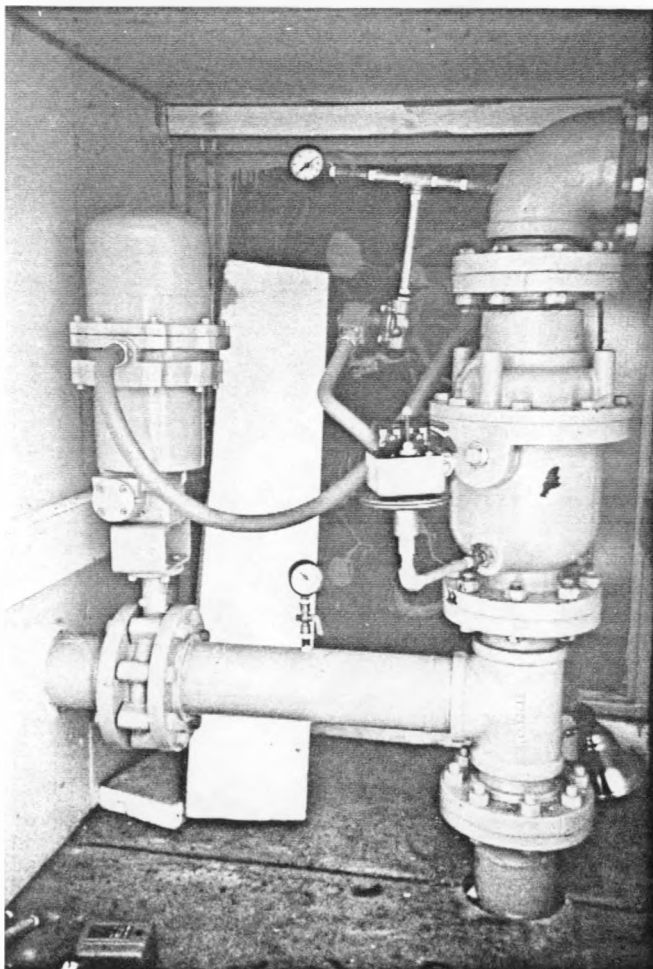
Siphon Priming Valve and Vacuum Breaker Valve - Superior Dam Power Station
